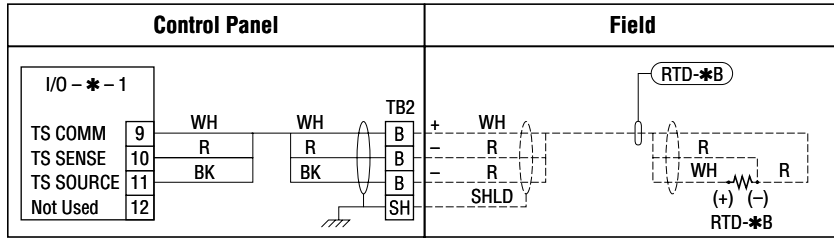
Typical RTD installation from the NGC-40-IO module in a North American style panel
